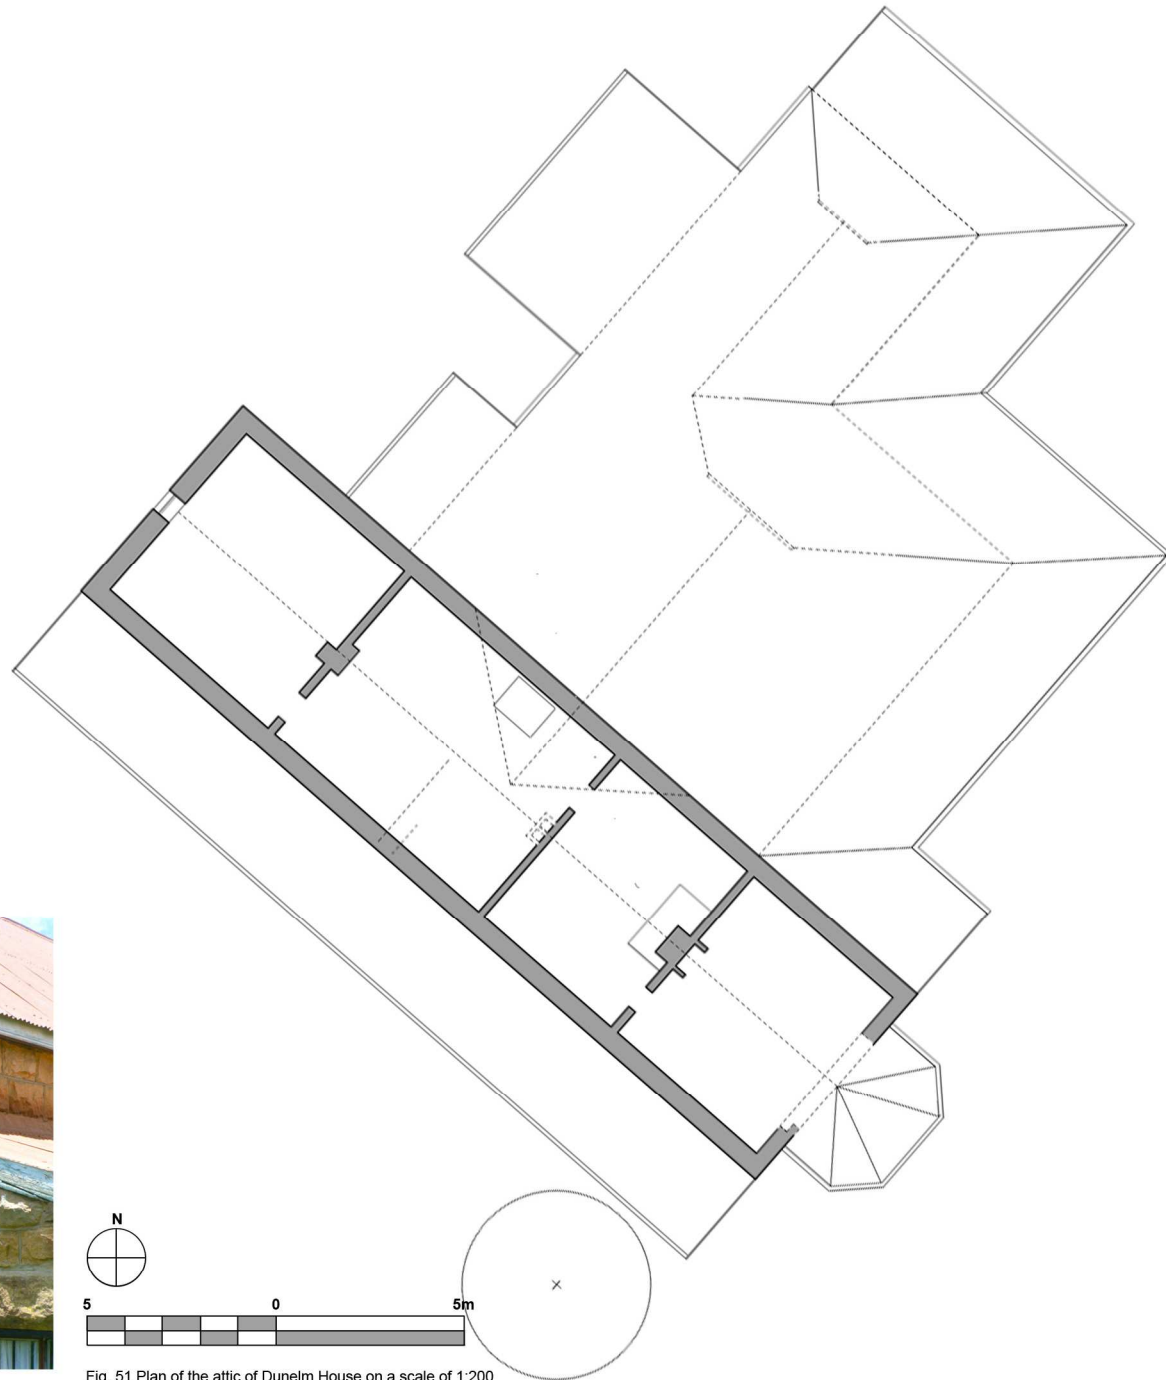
Plan of the attic of Dunelm House on a scale of 1:200
